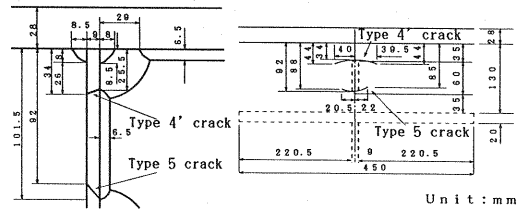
Types 4' and 5 fatigue cracks [Main girder B2-G1].
